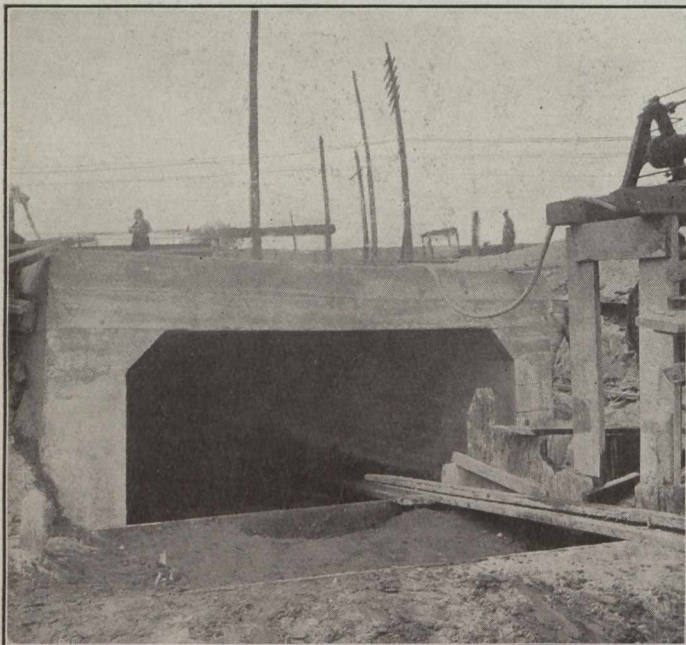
Keele Street Storm Overflow Sewer Outlet on the Beach Near Sunnyside.
